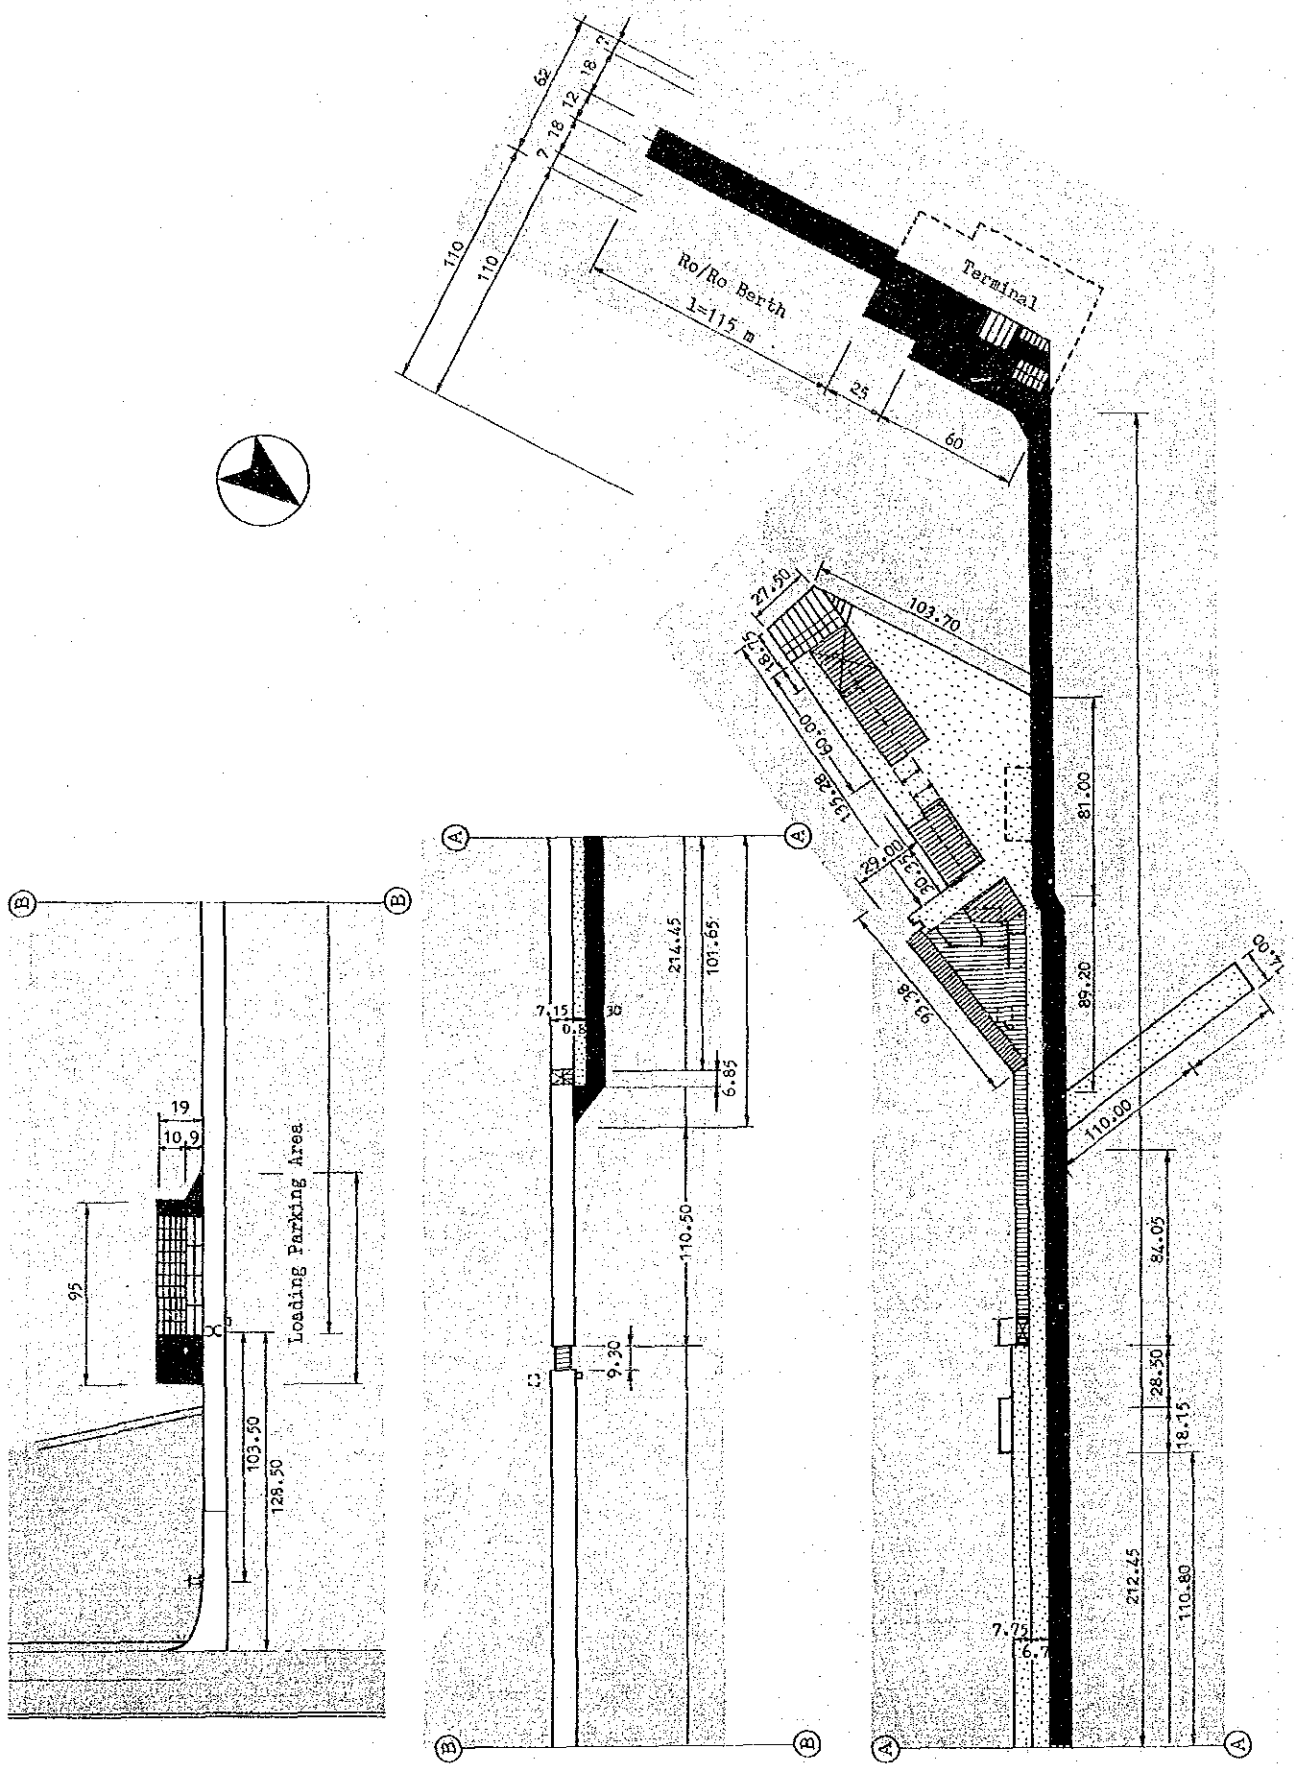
Short Term Ro/Ro Terminal Development Plan at Port of Bacolod
